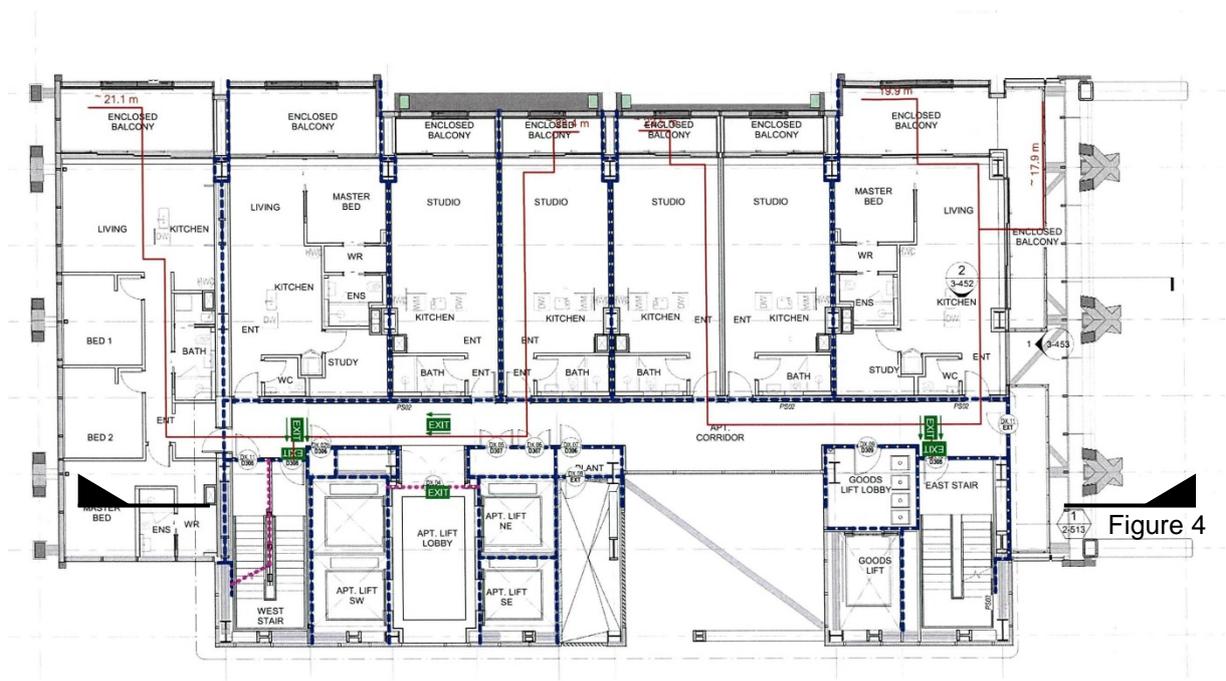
(a): Plan L39 showing transition corridors from Upper West Stair (not to scale)
